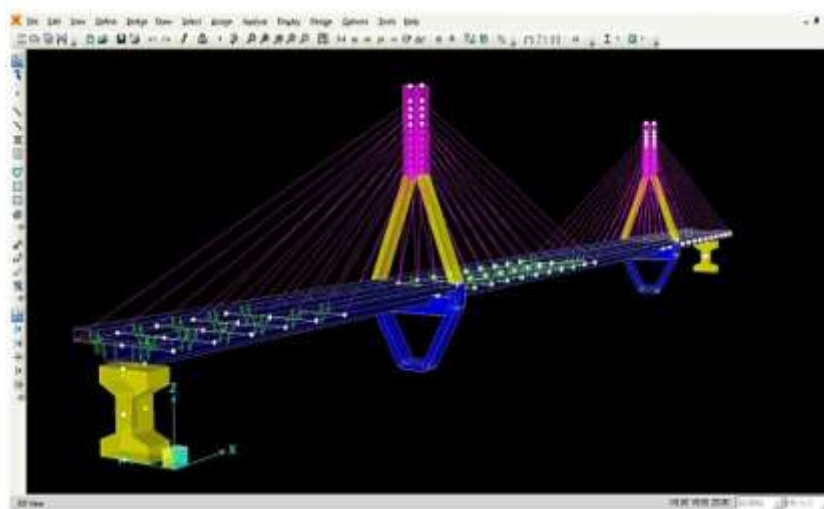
Cable stayed bridge modelled in SAP2000.
